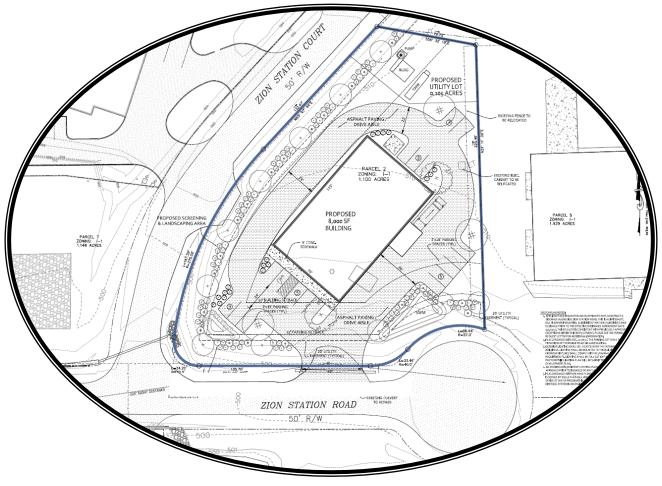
Greenberry's Site Development Plan (SDP 17-07).
